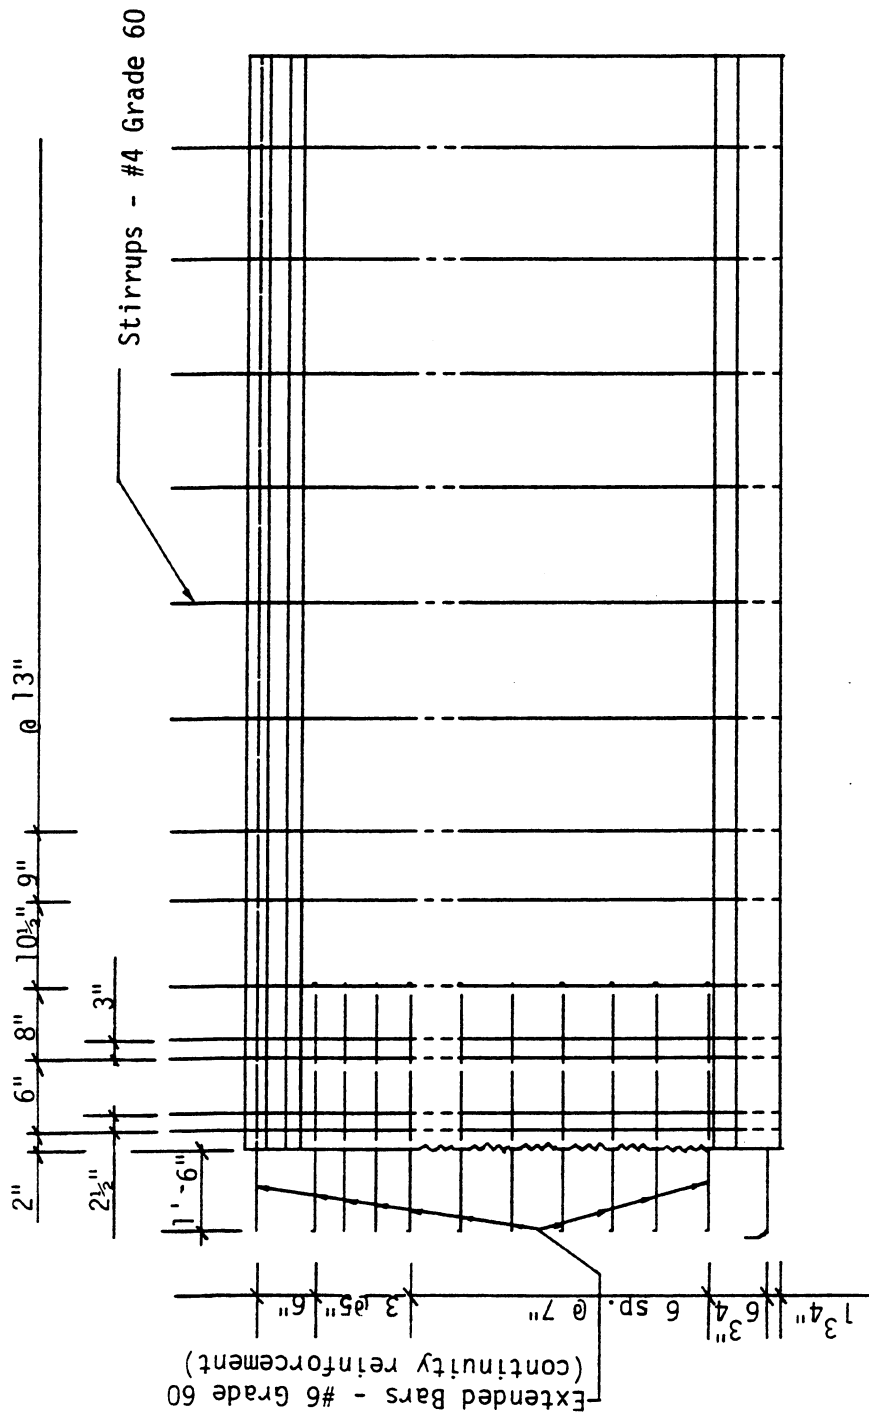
Field Test - Shear and Continuity Reinforcement in Girder 5D
